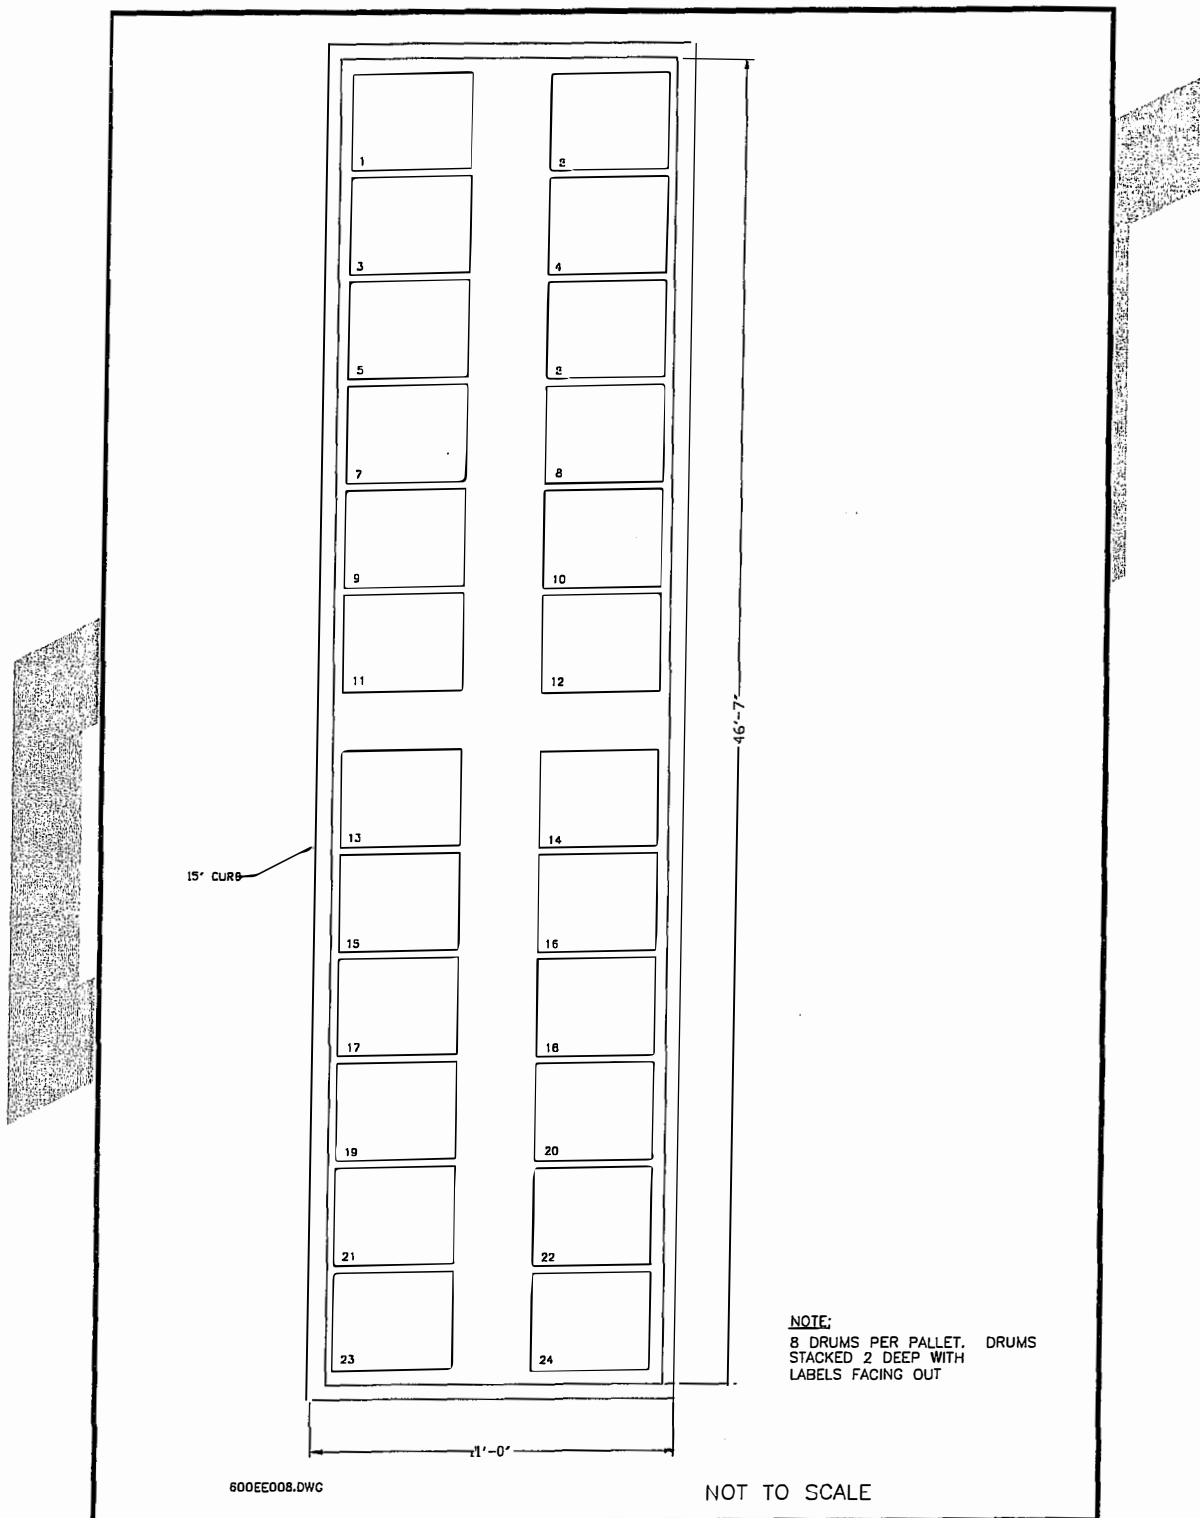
Containment Area in Buildings S22903(A), 22904 (B)& 22905 (C)
